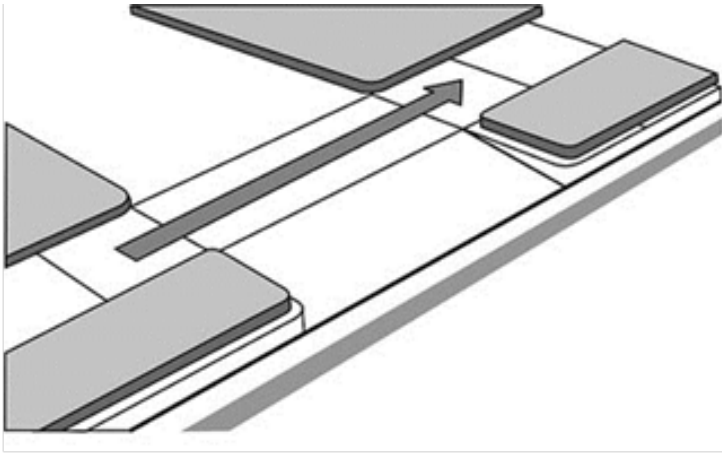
Primary driveway designed as a street, leading to off street parking located behind the primary structure. Primary driveways should be designed as streets and should include pedestrian facilities such as sidewalks.
